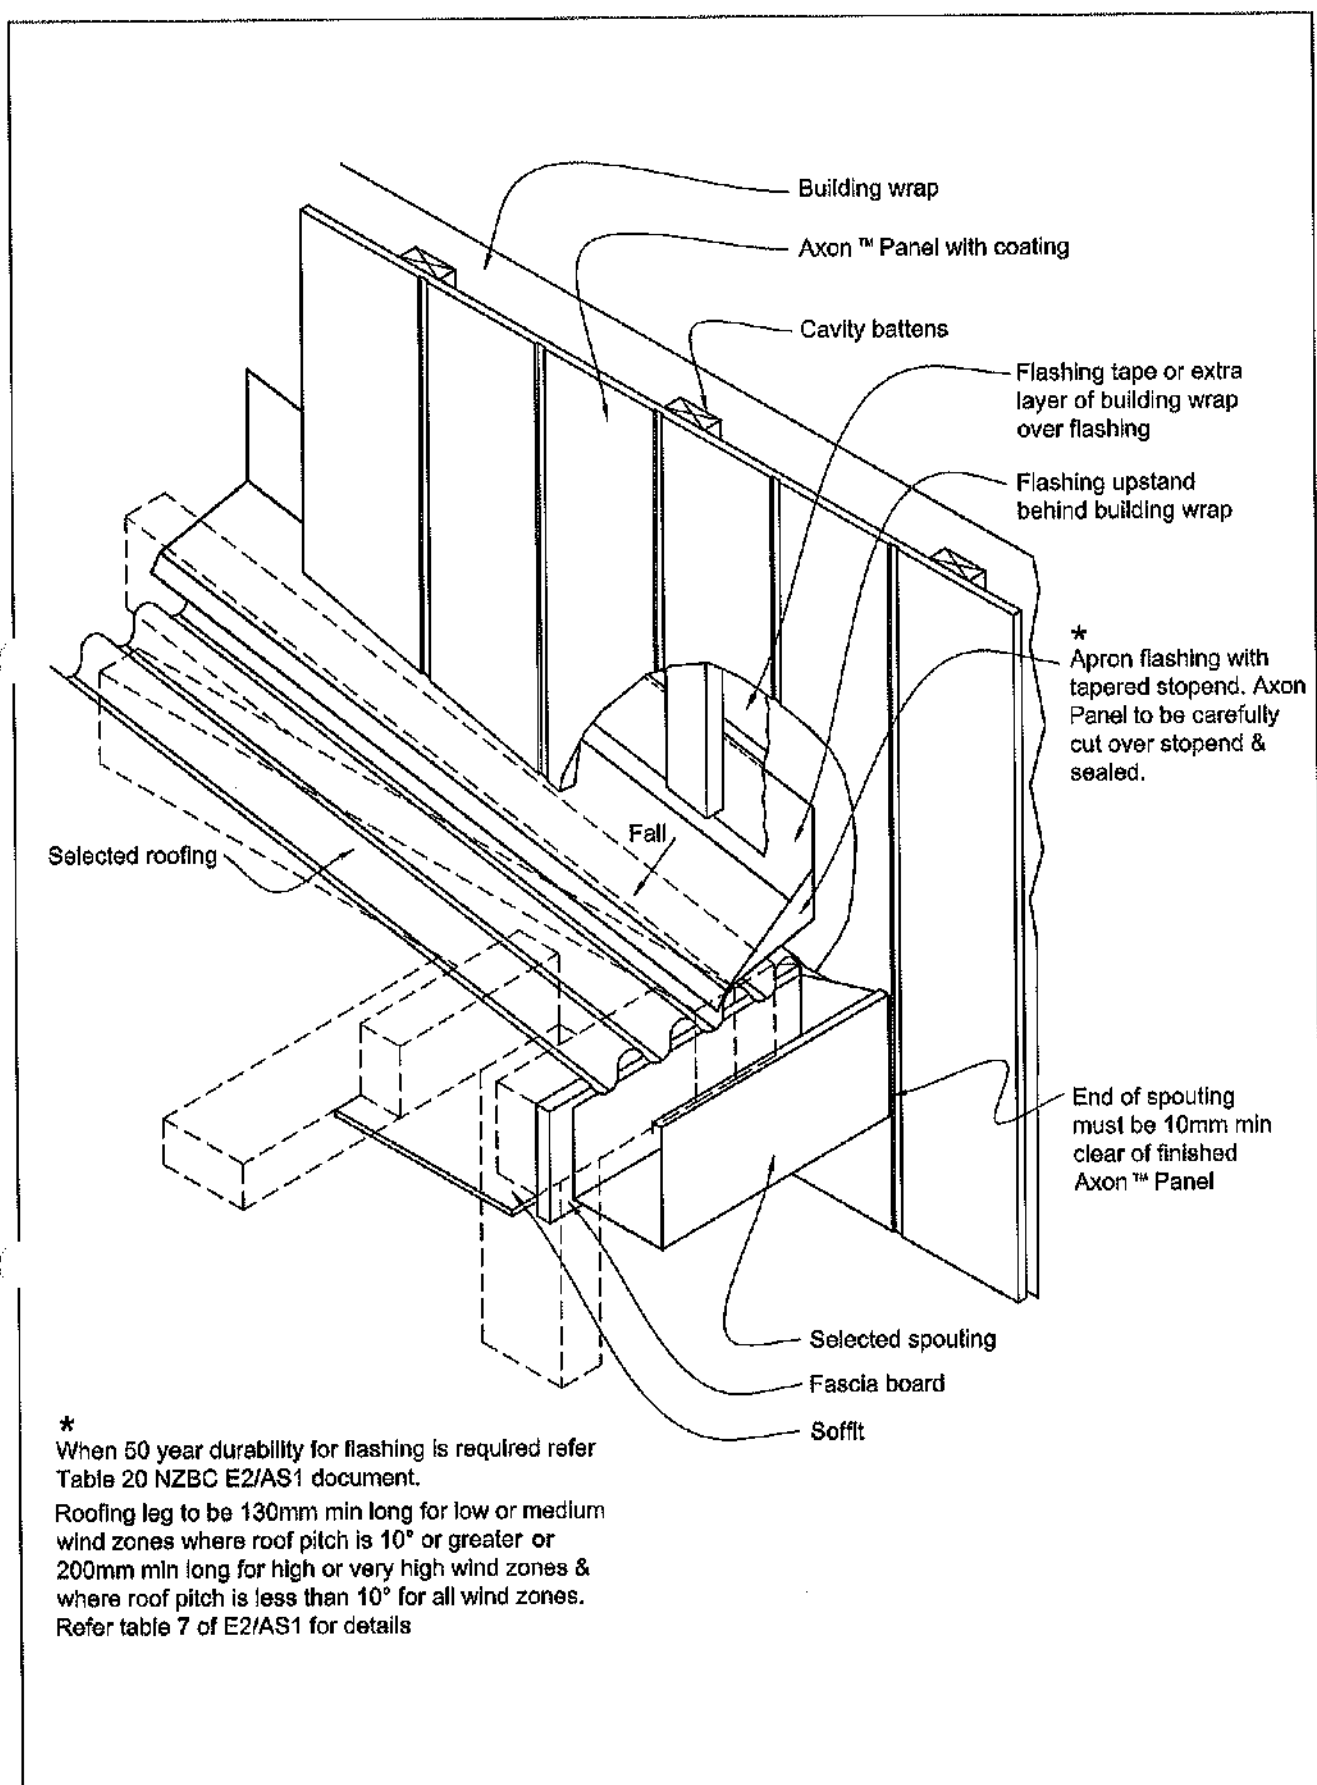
ROOF TO WALL JUNCTION DETAIL
